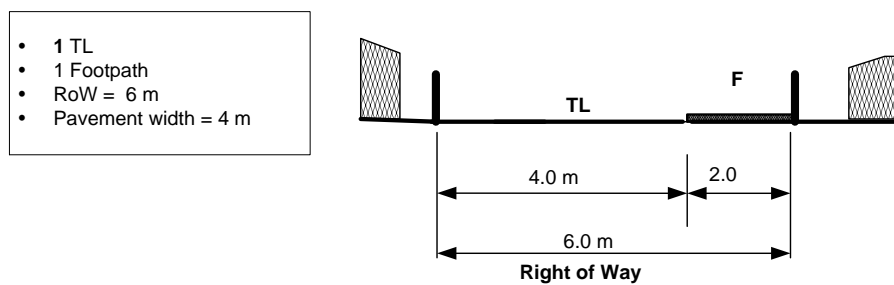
, Typical Cross section of Class D Roads (RoW 6 m)
